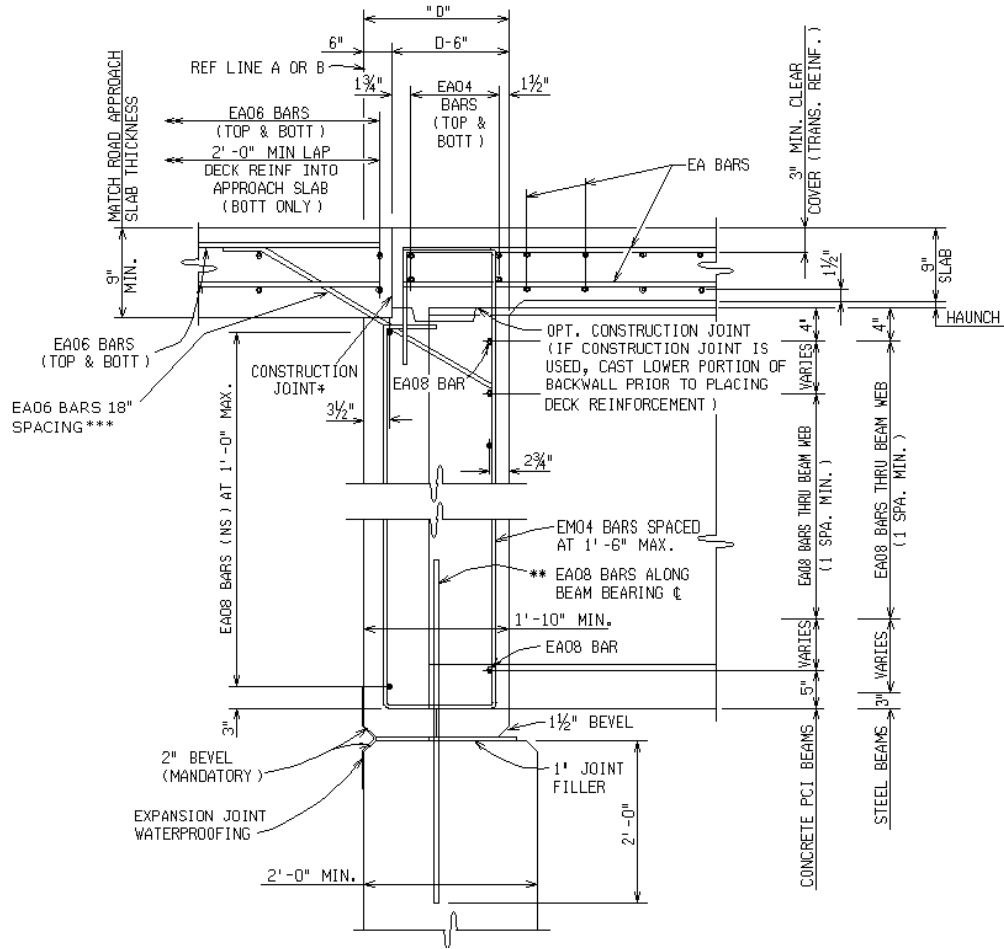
Proposed dependent backwall details for new construction; i.e., top and bottom reinforcements are discontinued at the construction joint and diagonal reinforcements are provided connecting approach slab and backwall.
